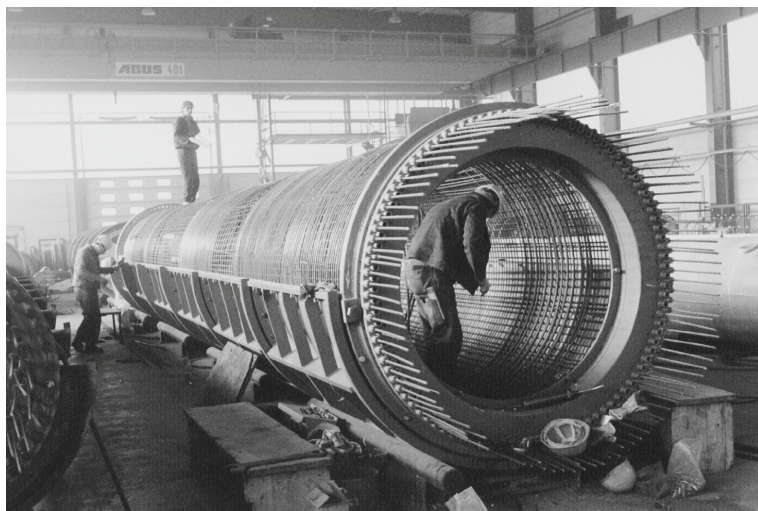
Manufacture of centrifugally-cast concrete towers (PFLEIDERER)
